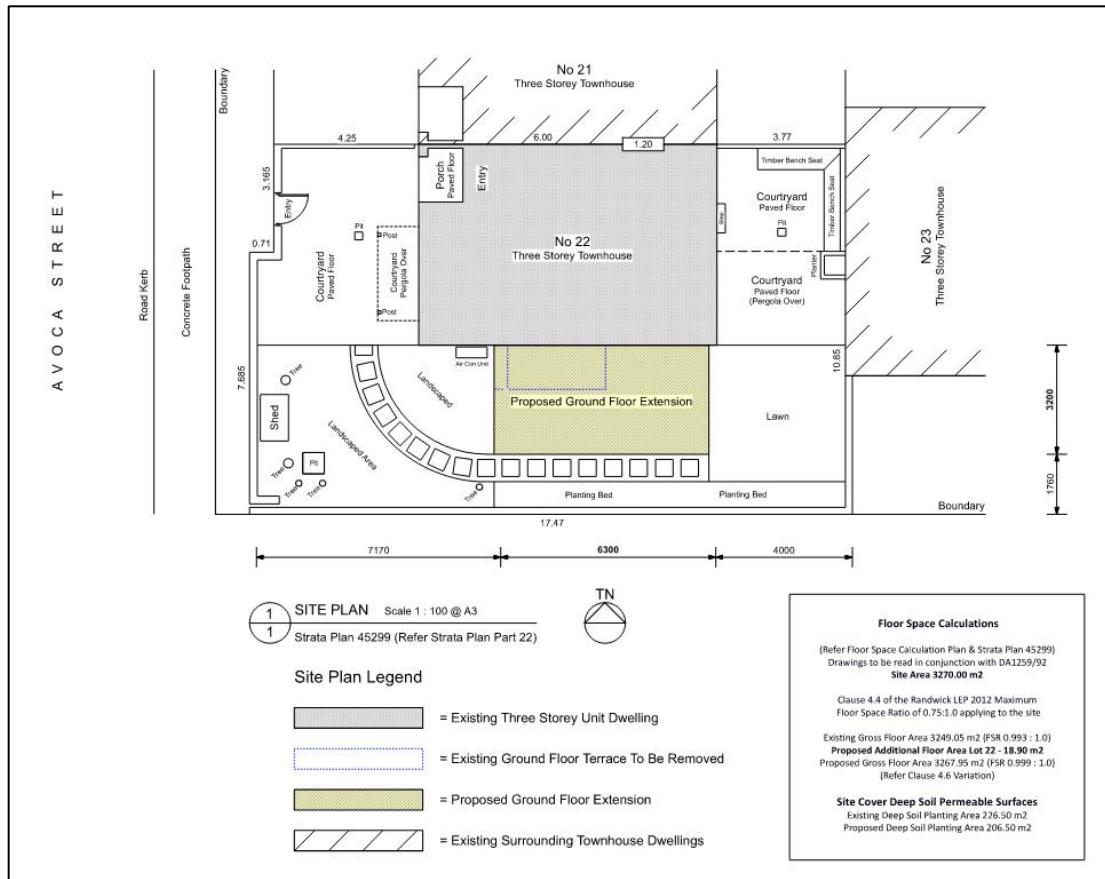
Proposed Site Plan (Source: Red Rock Design).
